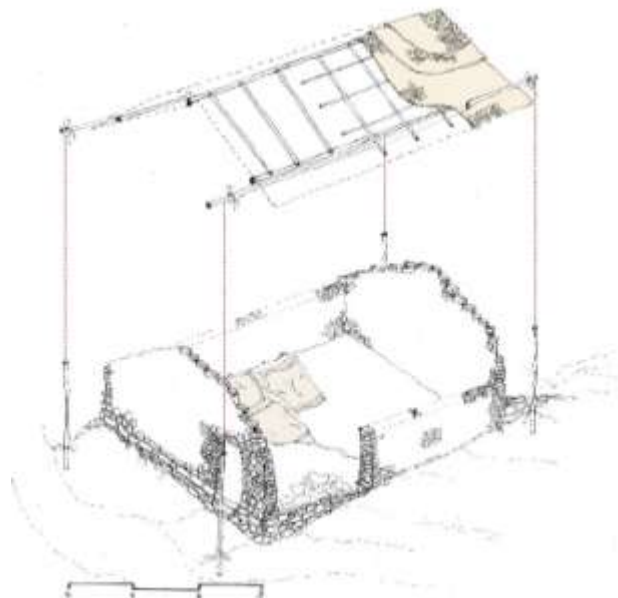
A HOUSE MADE UP OF STONE AND BAMBOO CARPET AS ROOF IN SENGE
